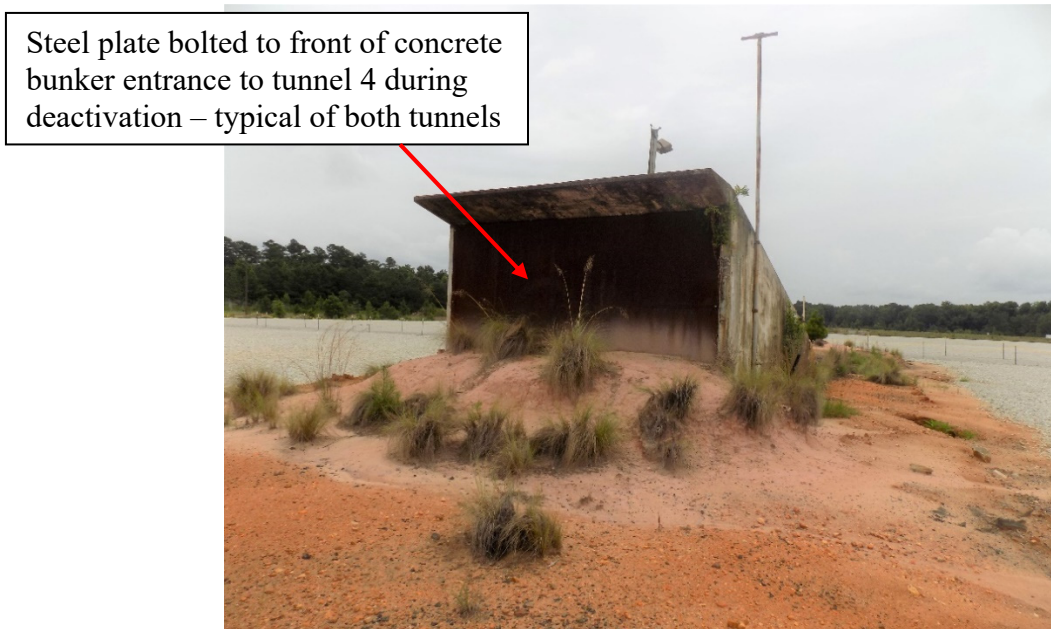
Close-up of the Concrete Bunker Entrance to Conveyor No. 4 Underground
